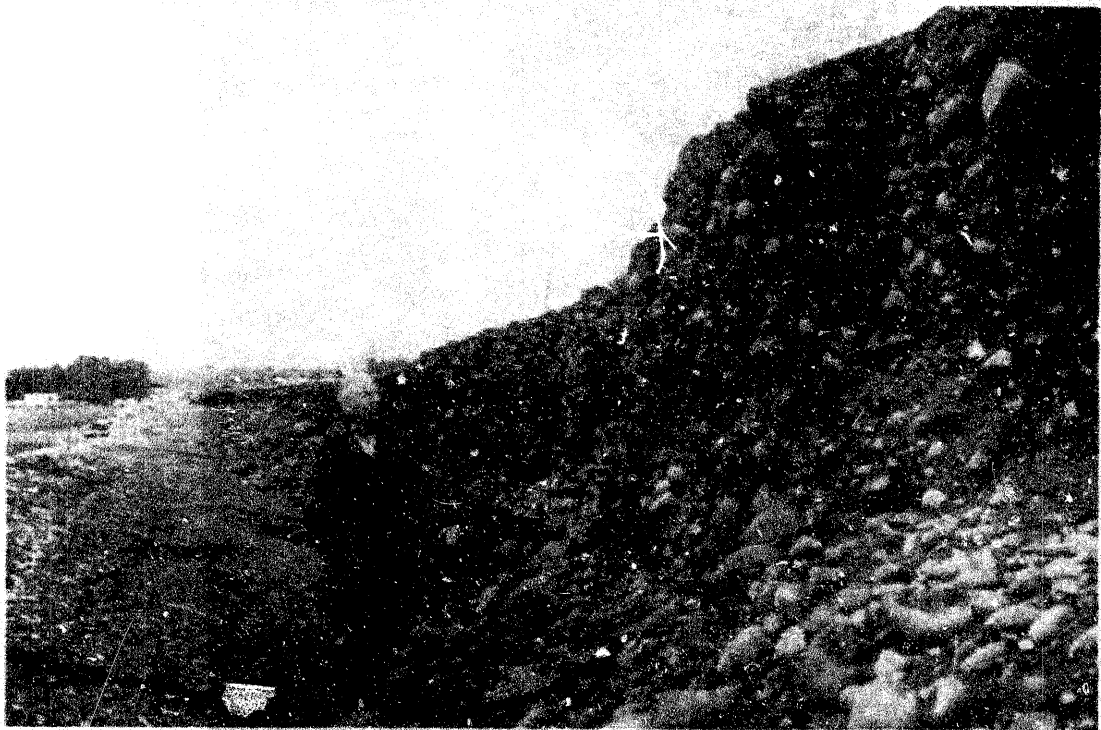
VIEW OF EXPOSED PORTION OF EMBANKMENT AFTER FAILURE
